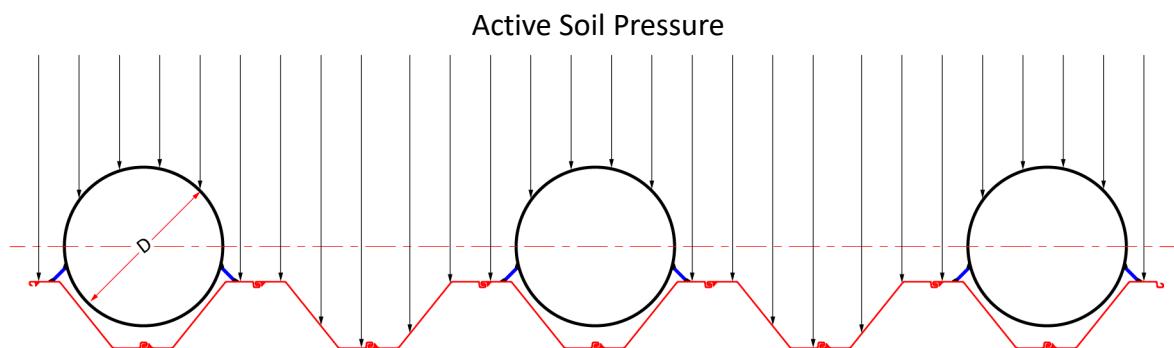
(b). Earth pressure diagram - Plan in section D-D (Pattern B, above formation level)
